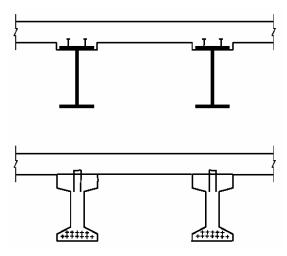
Composite Concrete Deck on Steel Beams and Pretressed Concrete Beams
